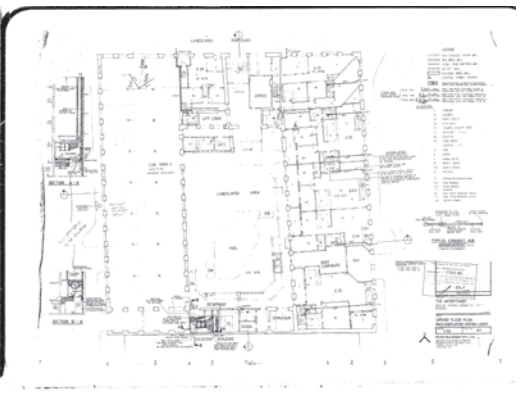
Ground Floor Plan, Peter Mulrone Pty Ltd.
